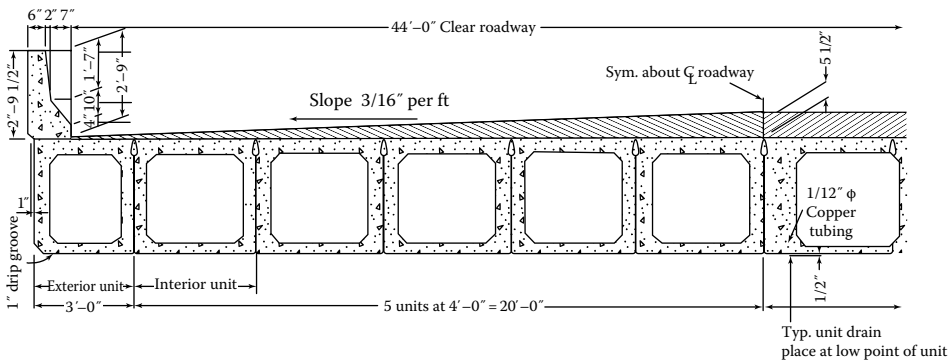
Superstructure system Type *g*: adjacent-prestressed concrete box girder superstructure with integral concrete deck with or without transverse posttensioning. (Note: dimensions shown are for illustrative purposes only; cross-sectional dimensions may vary depending on the number of design lanes.)
